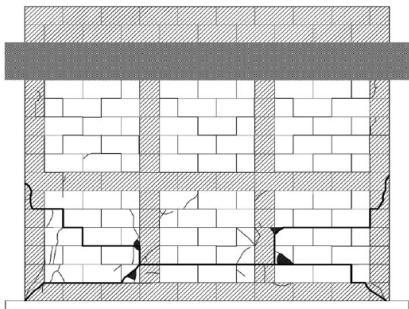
Partially-Grouted Wall Tested by Minaie [4]
